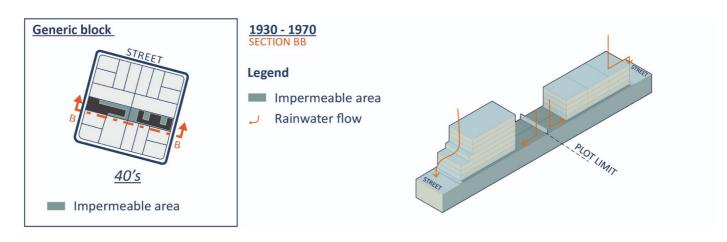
1940s block plan and section. Source: Authors, 2021.
